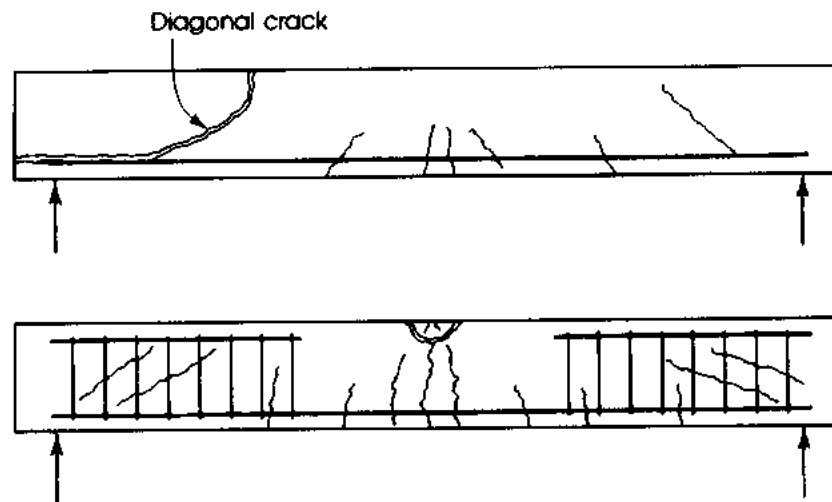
Shape of beam 1 at shear failure (top) and beam 2 at bending moment failure (bottom).
